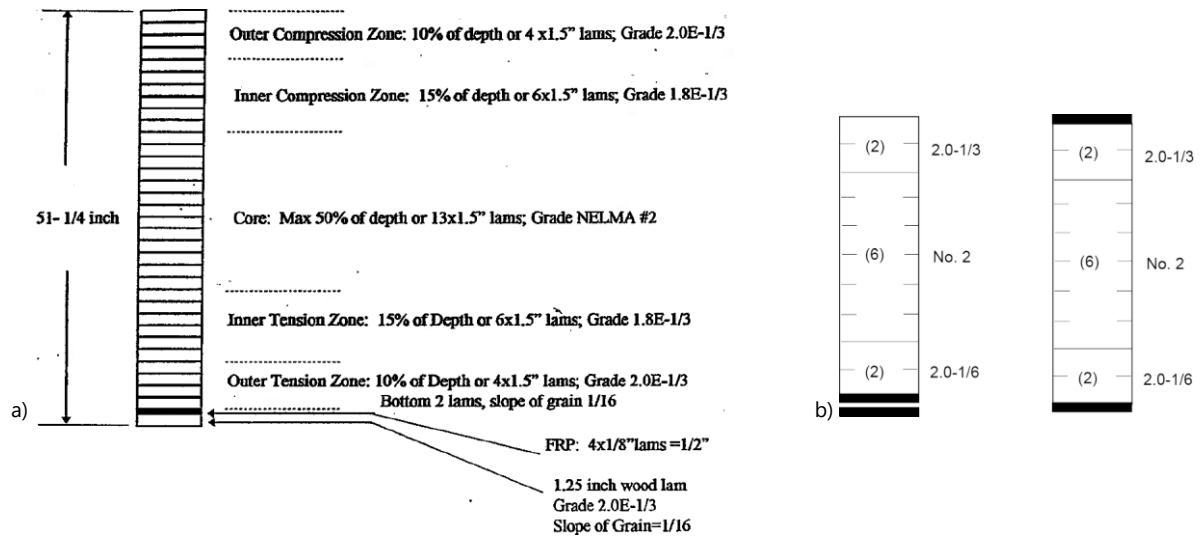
Lay-up of reinforced beams: a) GLT beam from Medway Bridge (Dagher et al. 1998c); b) beams with tension and tension and compression reinforcement (Hernandez et al. 1997).
